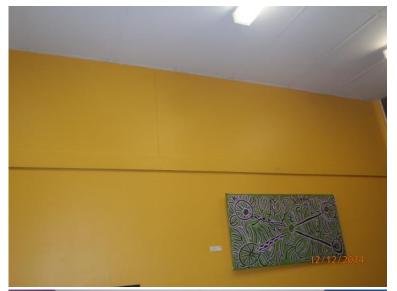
AC ceiling tiles throughout Shop 22 and backing board to electrical box (assumed asbestos containing).
